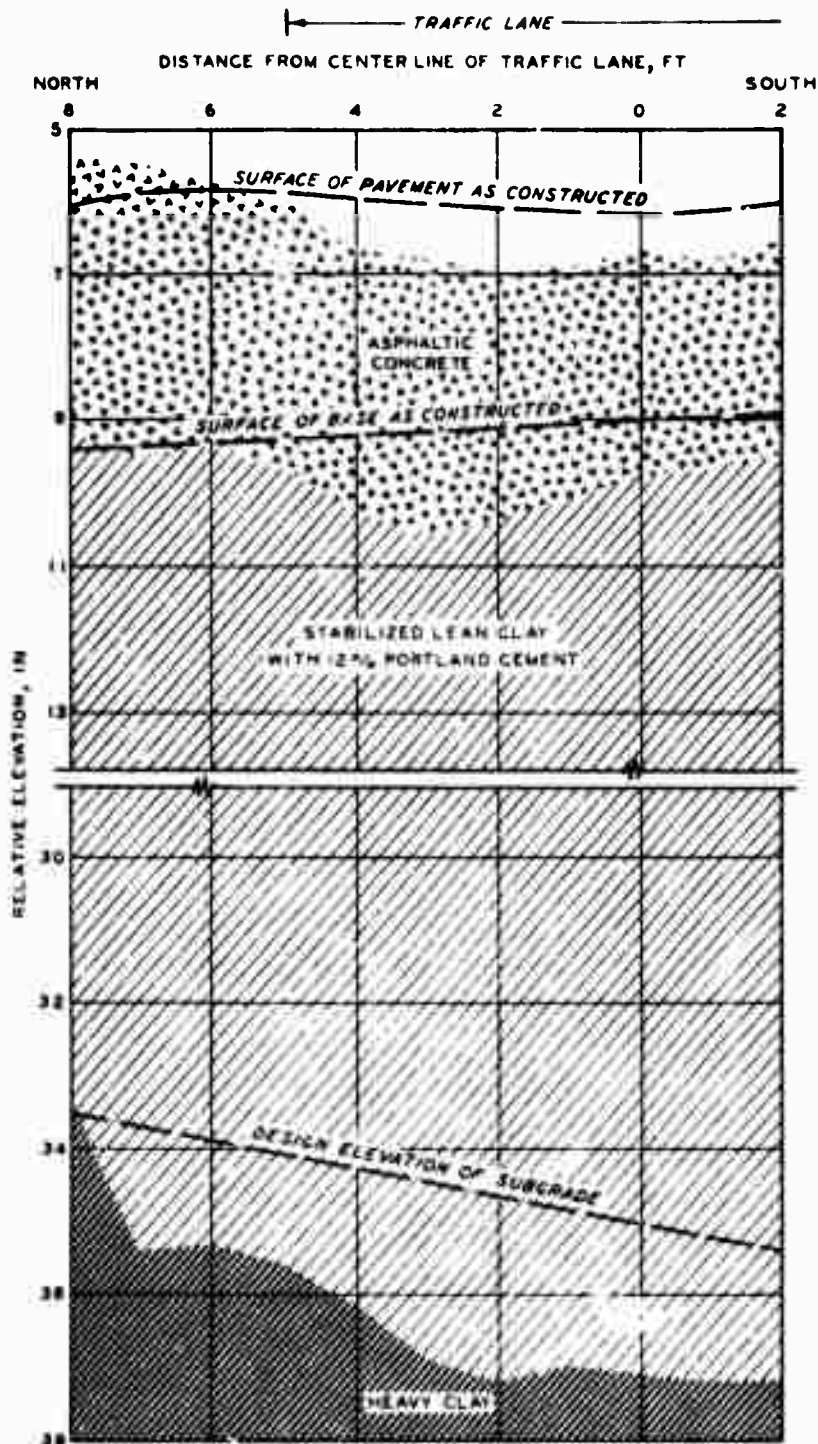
Test pit profile of item 2, lane 2, flexible pavement test section. Station 0+56 after 320 coverages of 240-kip twin-tandem assembly
